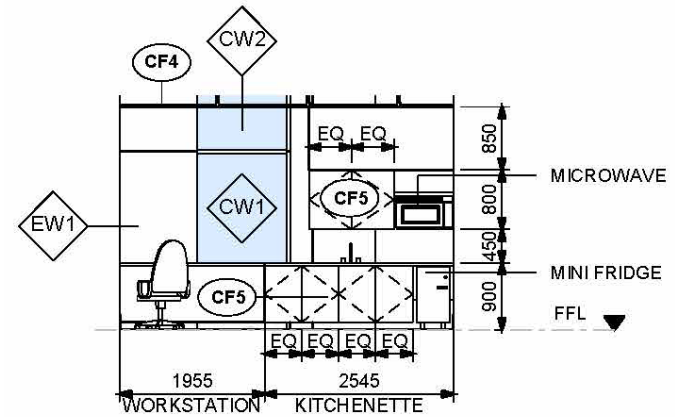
Section elevation of Station Ambassador Office and Back of House space showing kitchenette and work station.
